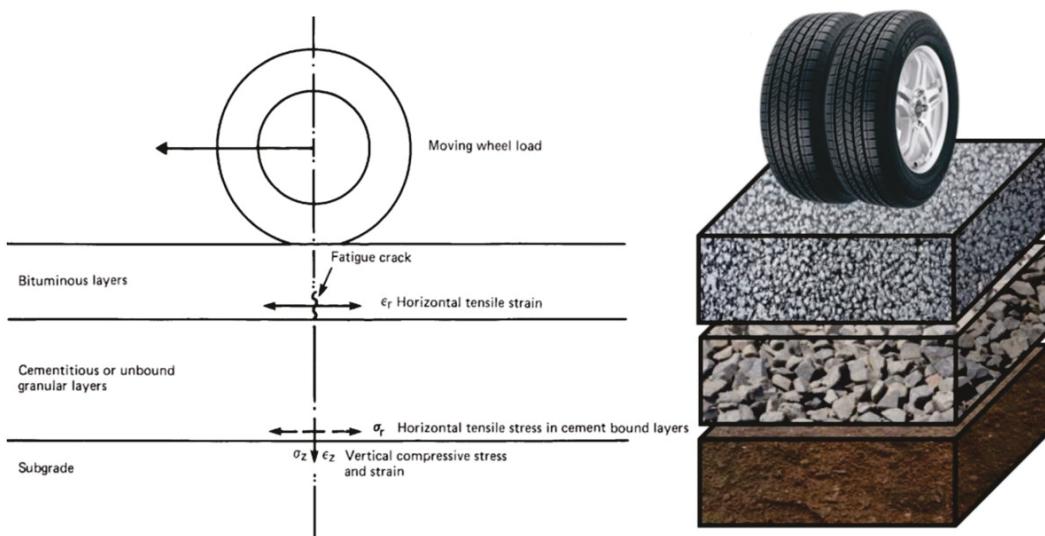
Critical asphalt pavements failure stresses. Adapted from Powell et al. (1984)
